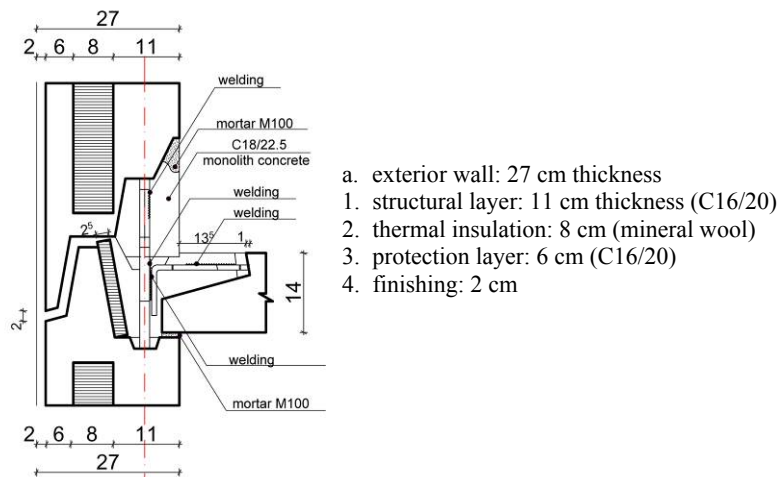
Prefabricated concrete panels for façade (1340-IPCT project): details for connections and insulation
